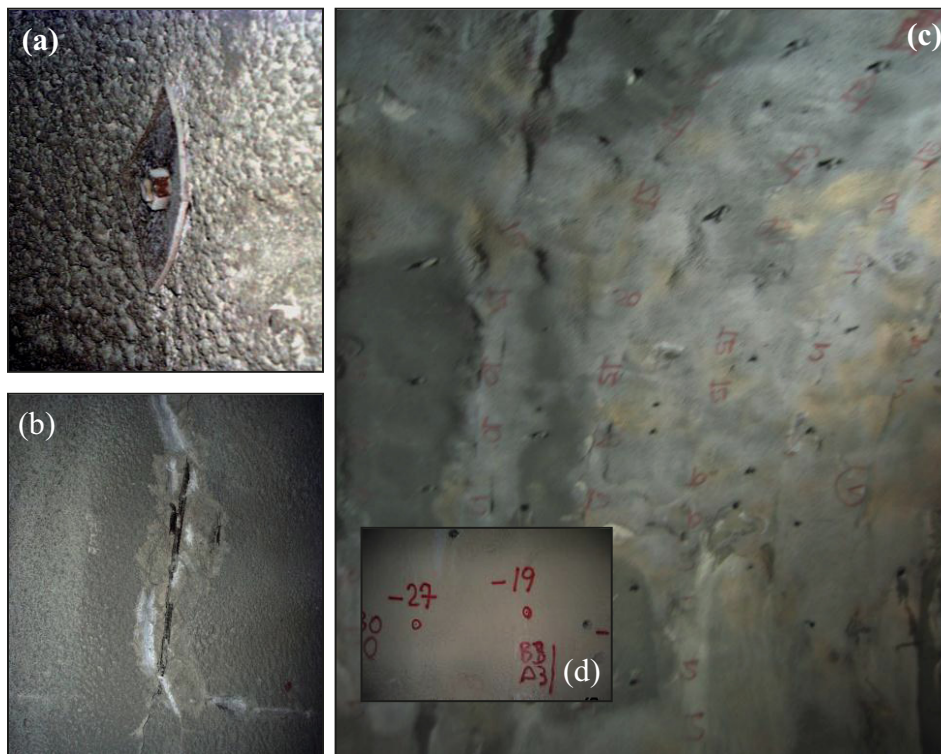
Excessive deformations experienced within section 4 of Driskos Twin Tunnel: (a) deformed rockbolt face plate as a result of overstressing of the primary support; (b) spalling of the shotcrete adjacent to a stressed steel set; (c) sidewall of Driskos Twin Tunnel denoting (in red in Web version of this paper and medium grey in print version) the total amount of inward displacements at selected, monitored target points; and (d) clearer designation of inward displacement in millimetres.
